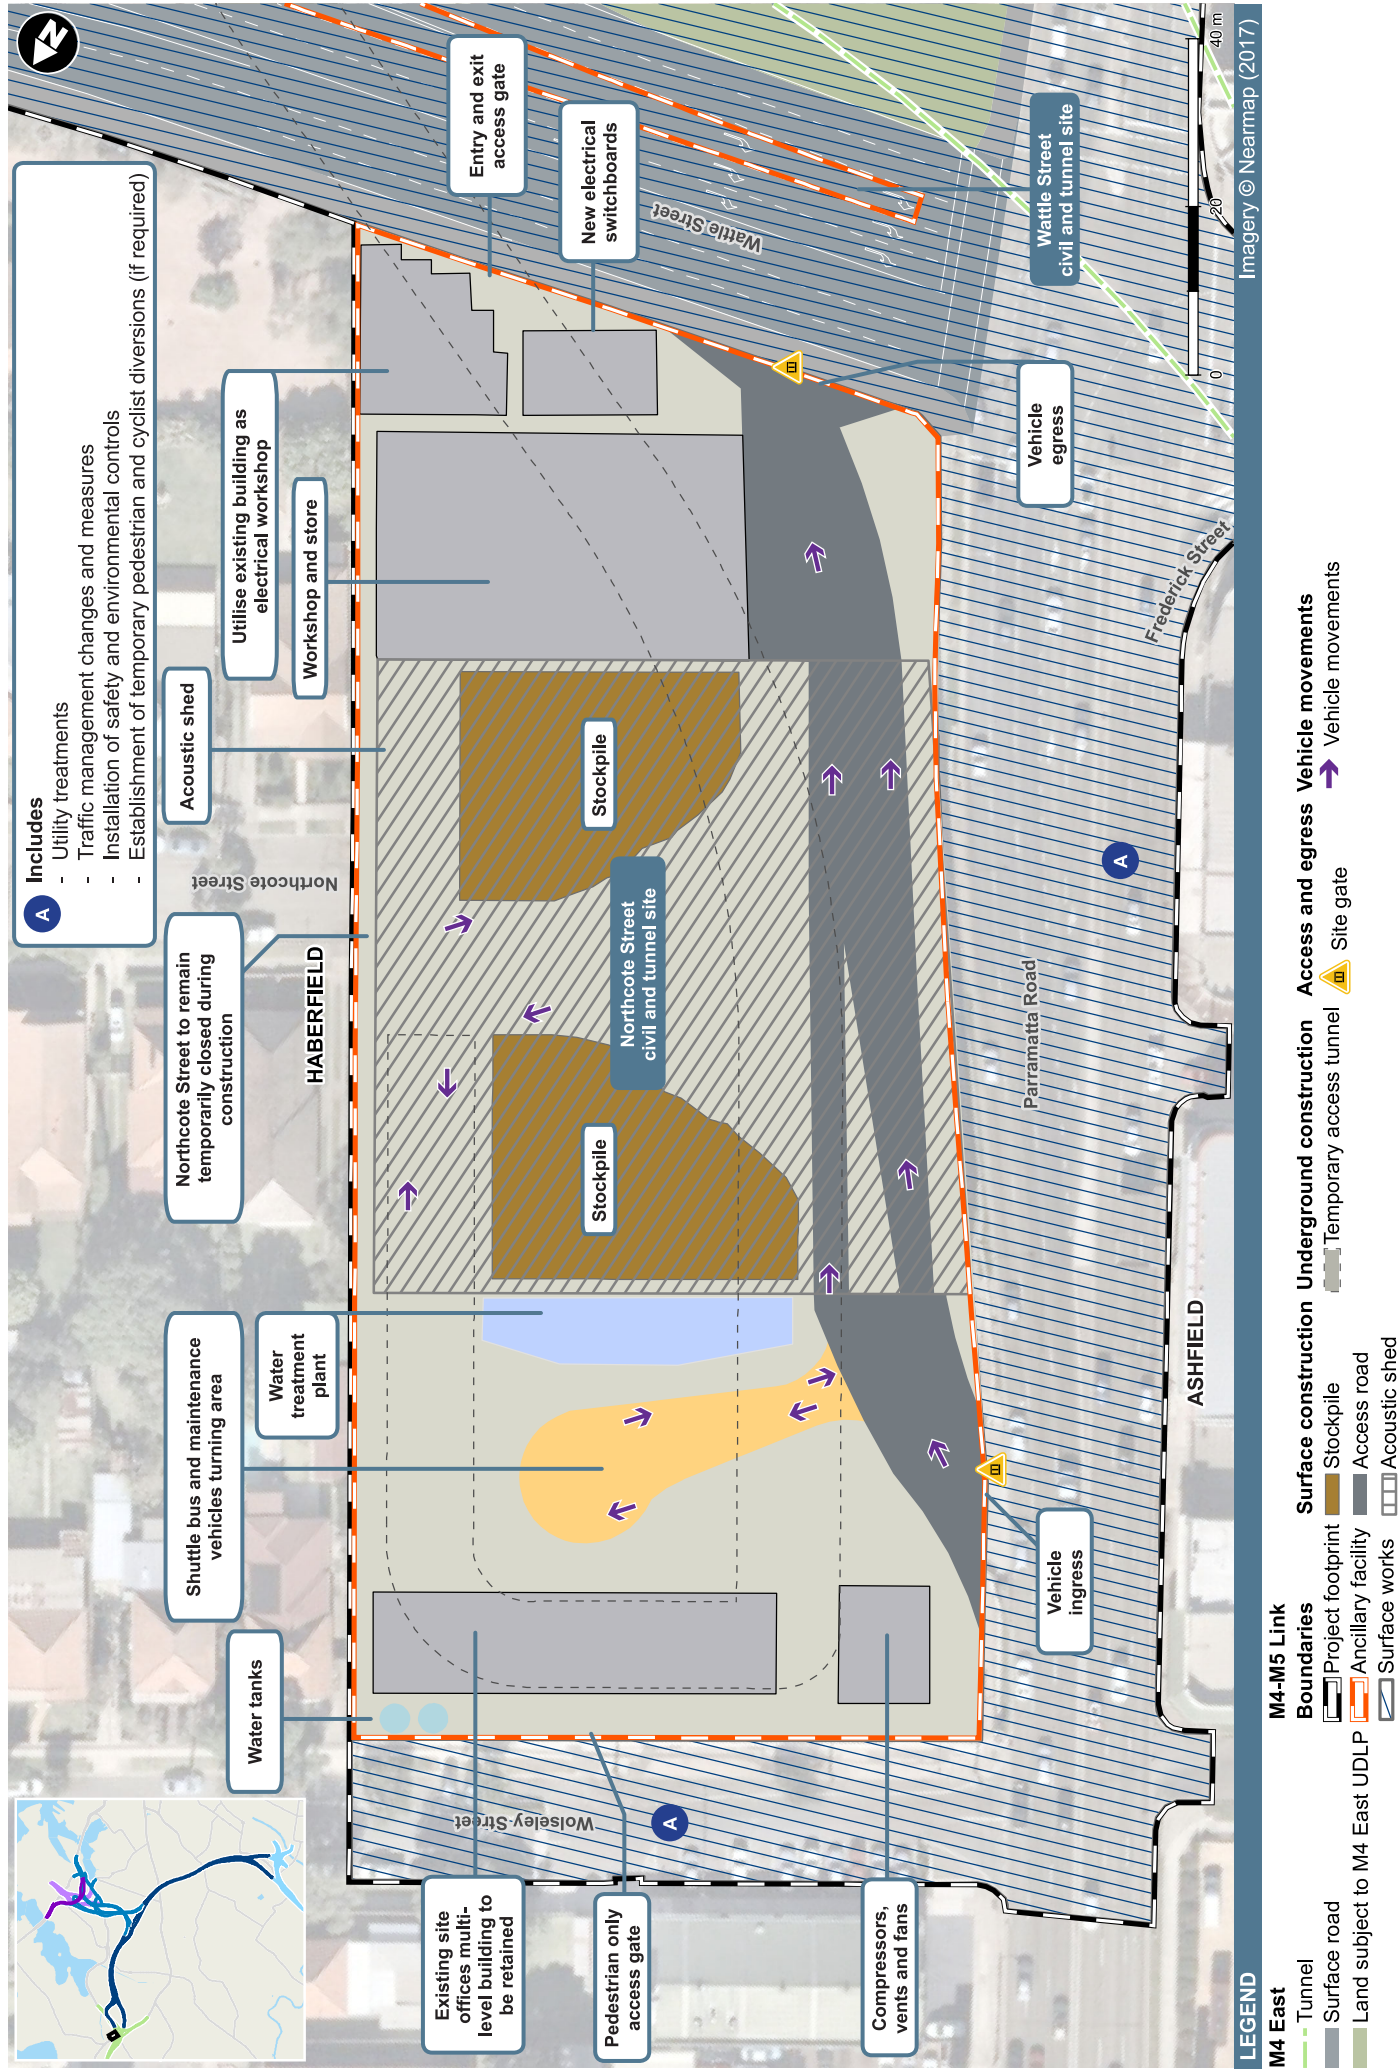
Indicative Northcote Street civil and tunnel site layout
